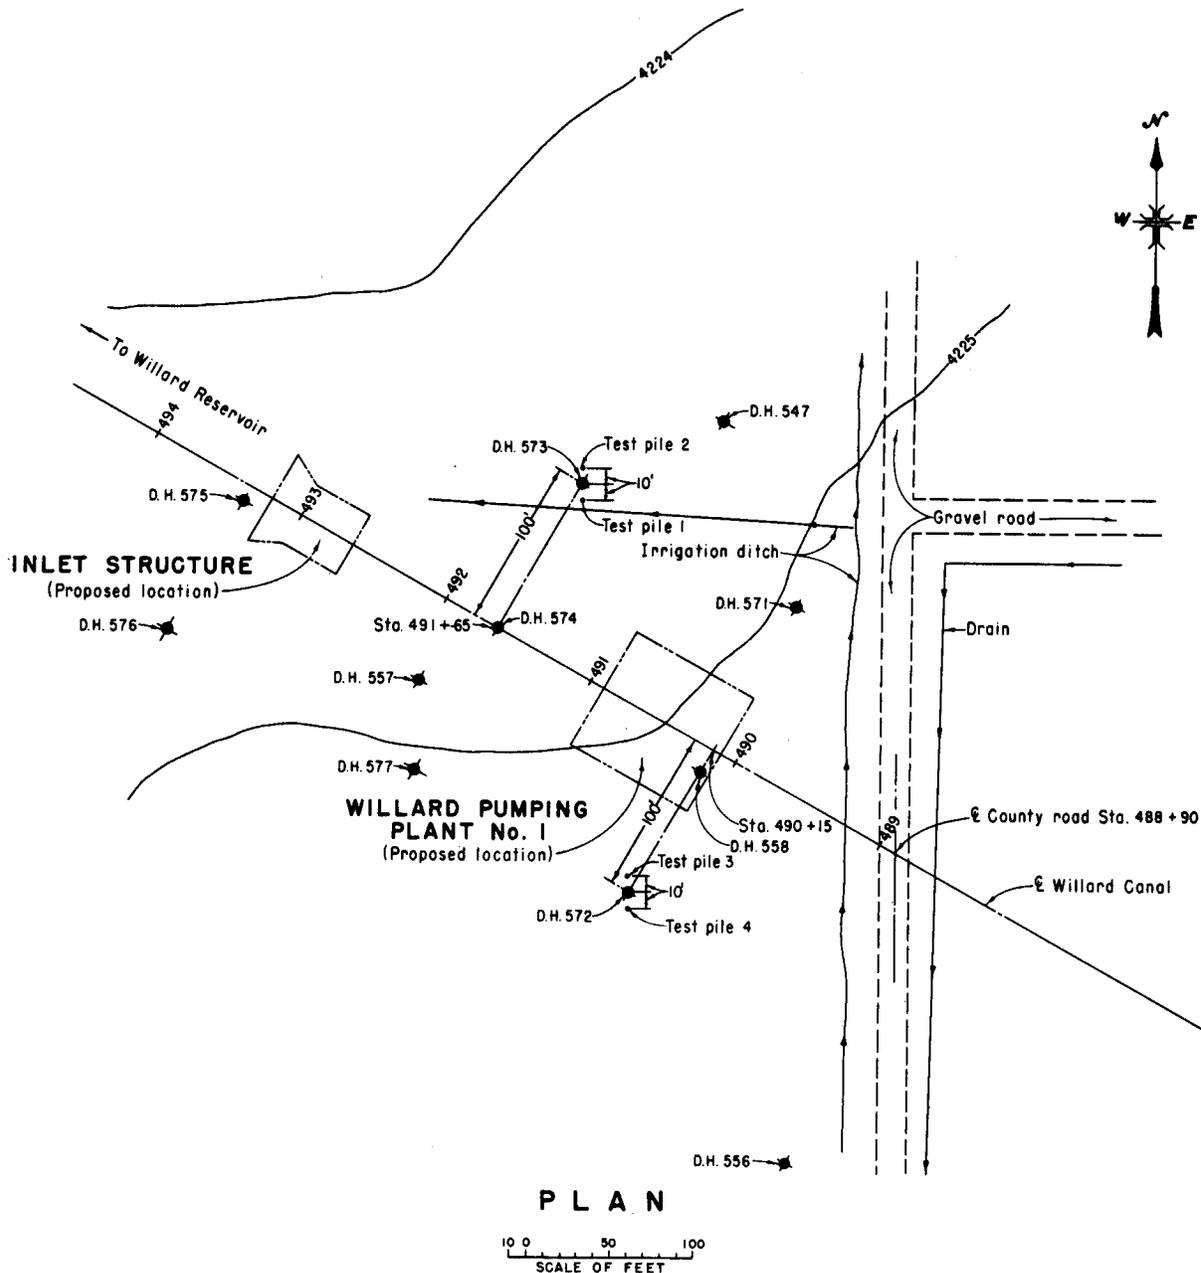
Foundation exploration and pile testing plan for Plant No. 1.
